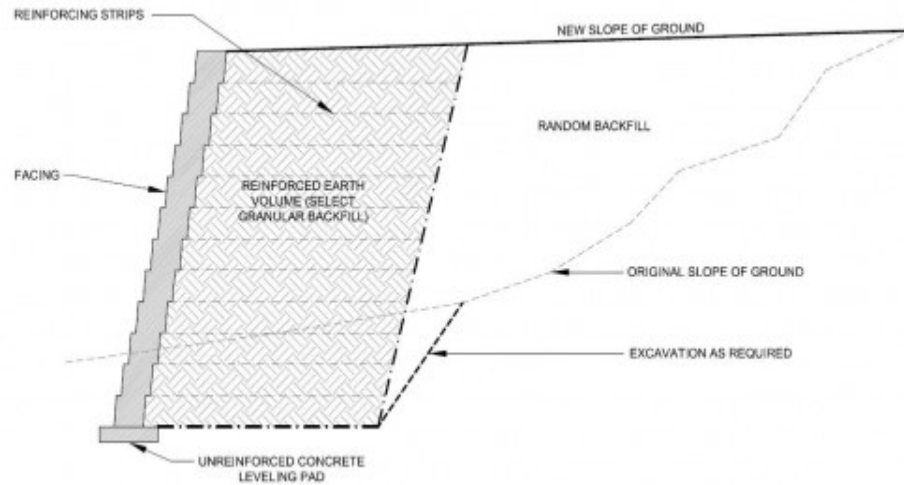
Mechanically Stabilized Earth (MSE) Wall.
